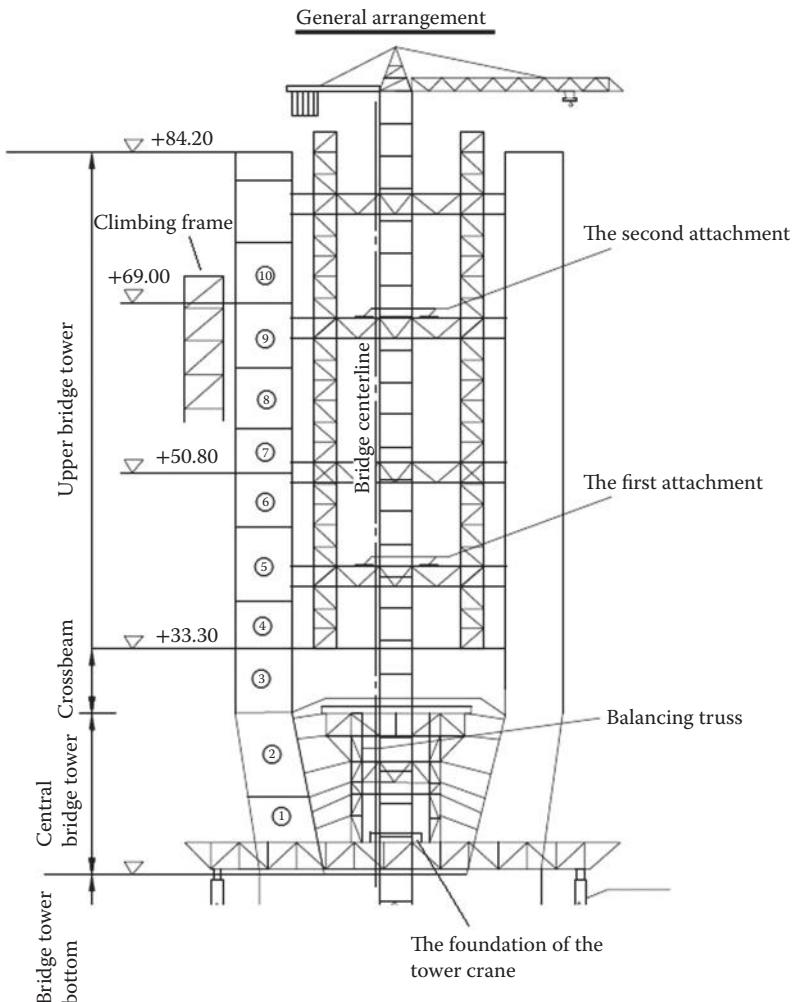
Construction layout of main tower pier. (From Zhou, M. B., *Bridge Construction*, (2): 14–19 (in Chinese), 2000a.)
